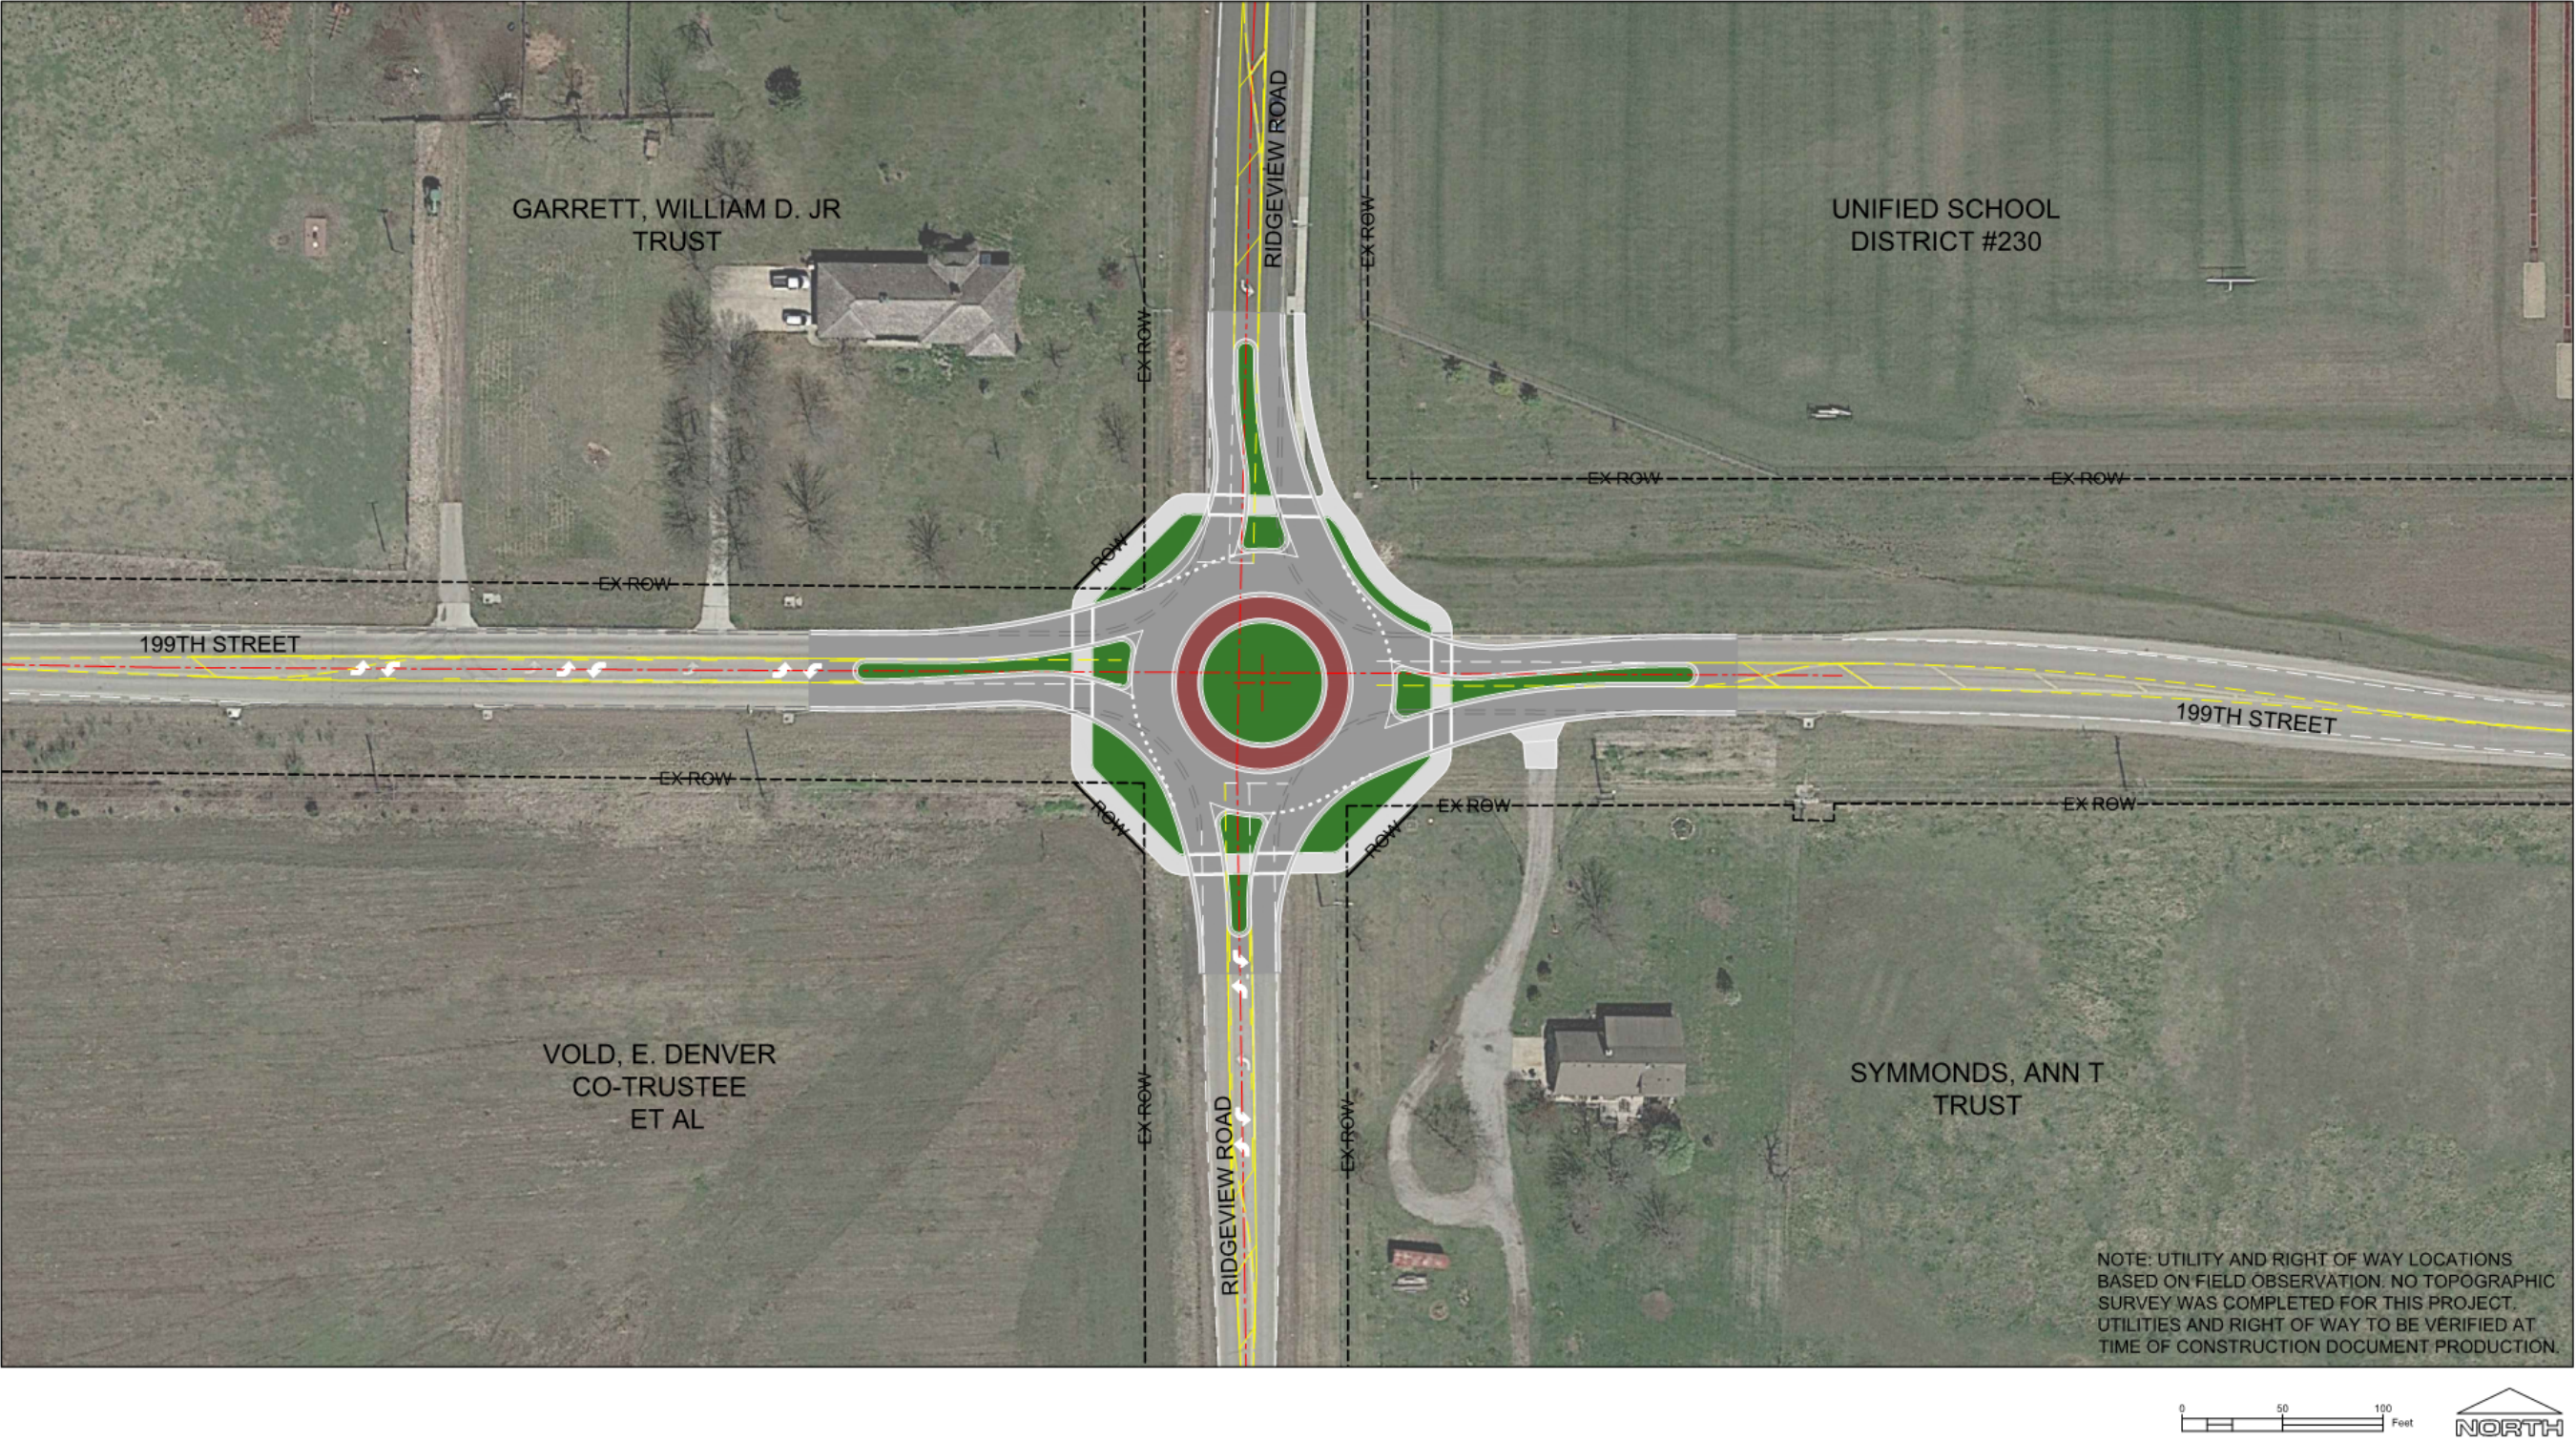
Design Concept Sketch for Single Lane Roundabout - 199th Street & Ridgeview Road
